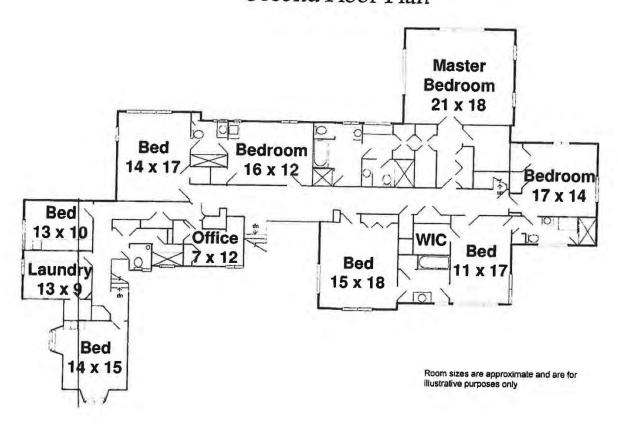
Existing Second Floor Plan of the main residence at 5 Briar Lane provided by Highgate Builders. The plan is oriented west.
